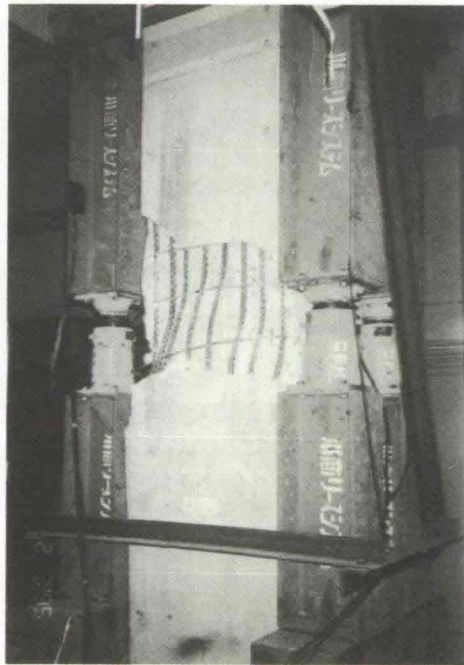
Temporary reinforcement to central pillars at Sannomiya station of the Kobe Municipal Subway
